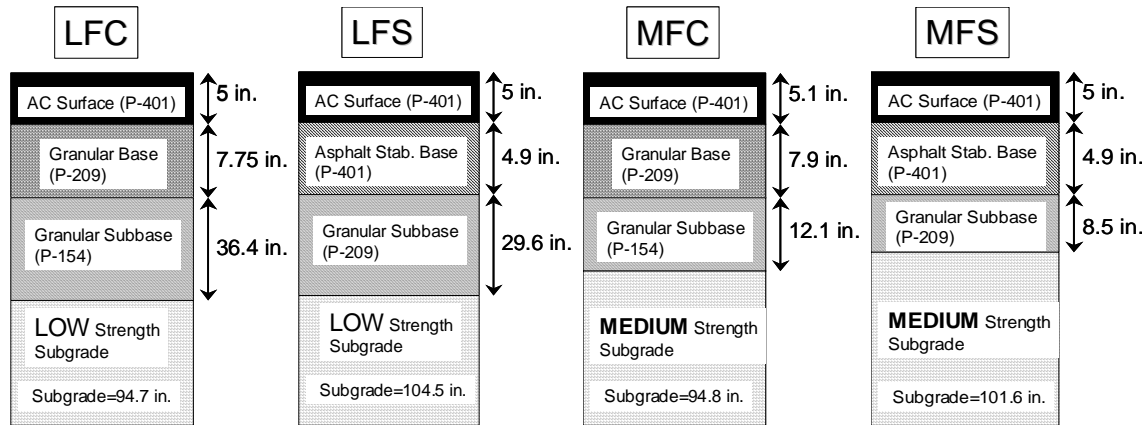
Cross-Sectional Views of “As-Built” NAPTF Flexible Test Sections
